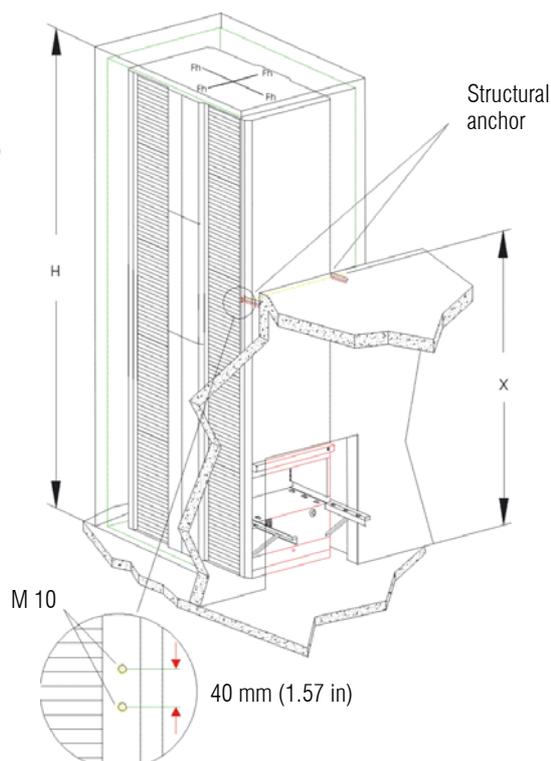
Reinforcement example: Structural anchors on an intermediate ceiling
